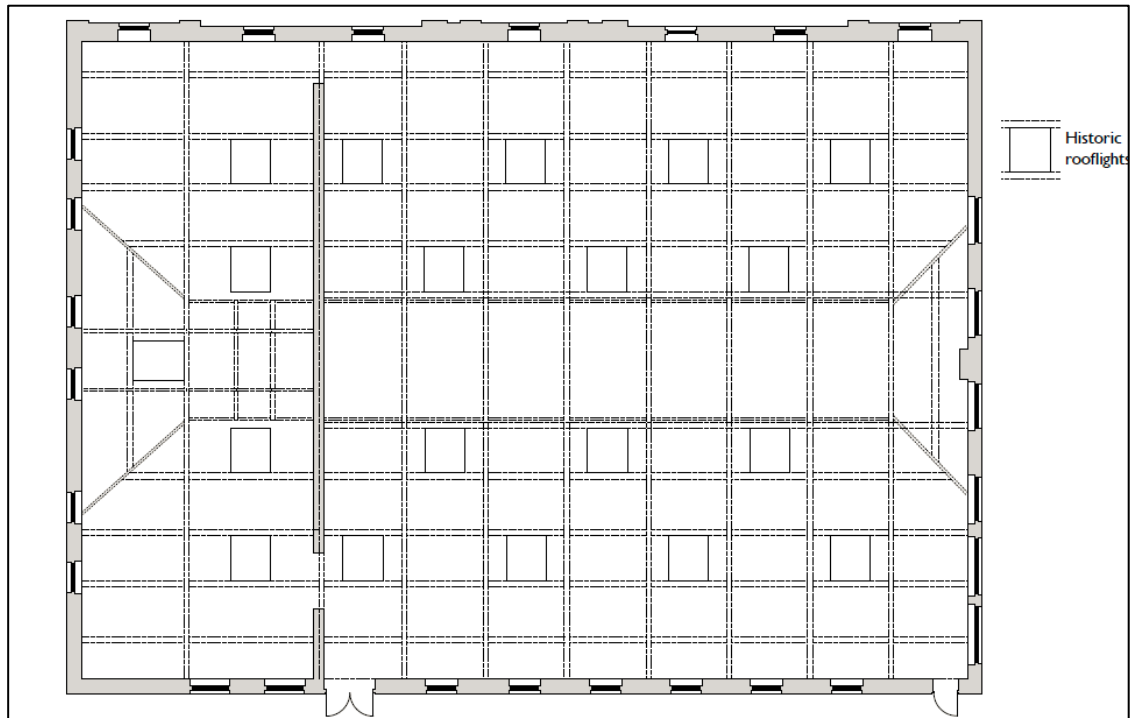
Reflective ceiling plan showing the positions of original rooflights.
